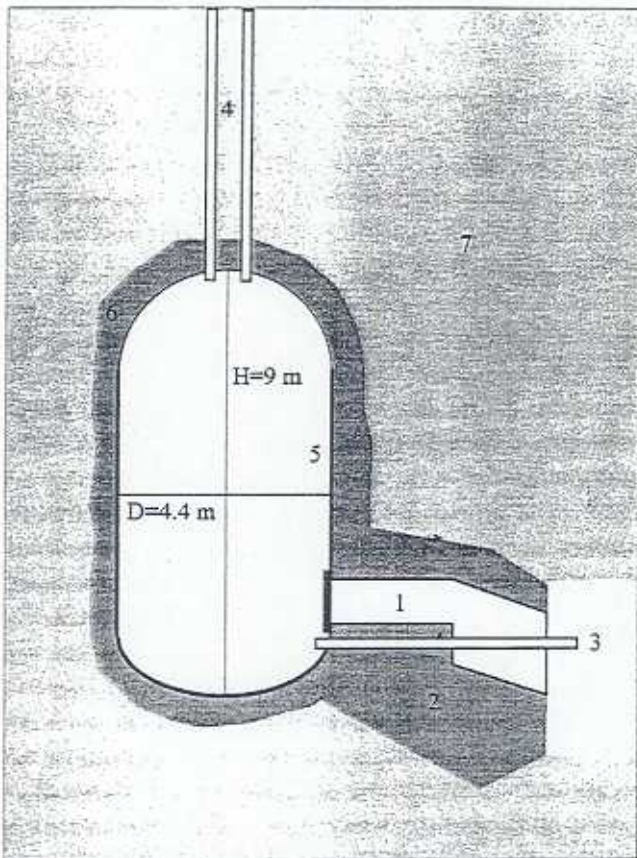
General layout of Room 2. 1. Access tube, 2. Concrete plug, 3. Water fill, 4. Gas fill, 5. Steel lining (6 mm), 6. Concrete lining (0.6 m), 7. Rock mass.
